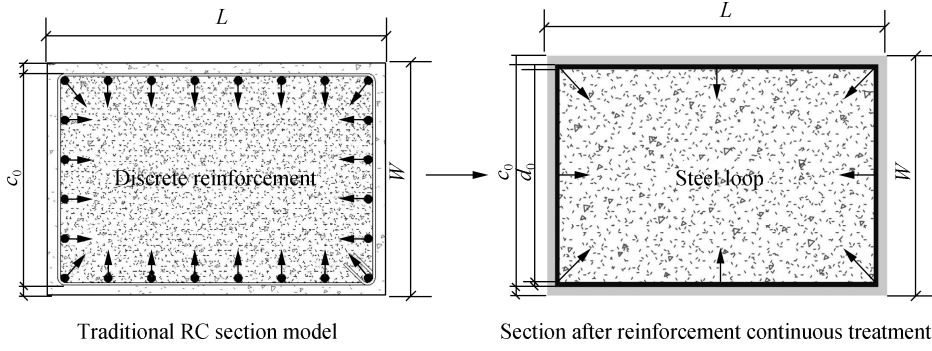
Continuous treatment of discrete longitudinal reinforcement
